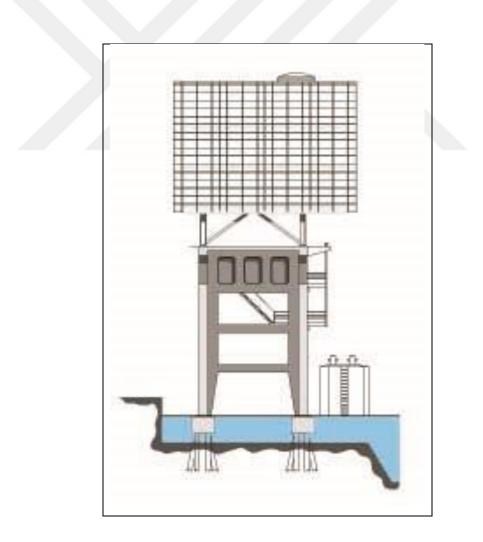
Side elevation of the Kraanspoor showing the light steell building unevenly overhung on the water side [62].
